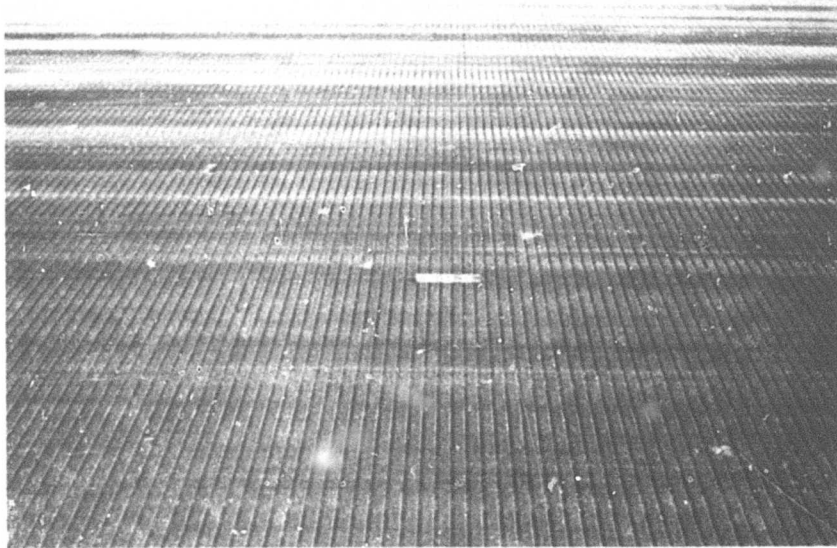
Chicago Midway Airport -- Grooved pavement in touchdown area, 1500 feet from southeast end of runway.
